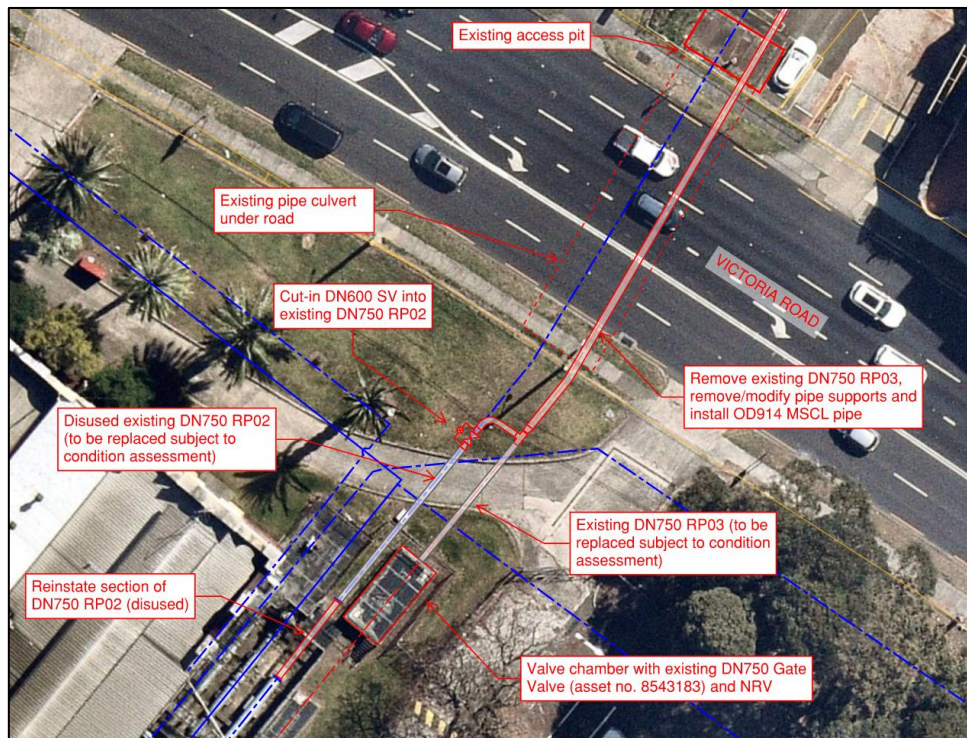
Detail diagram of the proposed watermain connection. (Source: Sydney Water)
